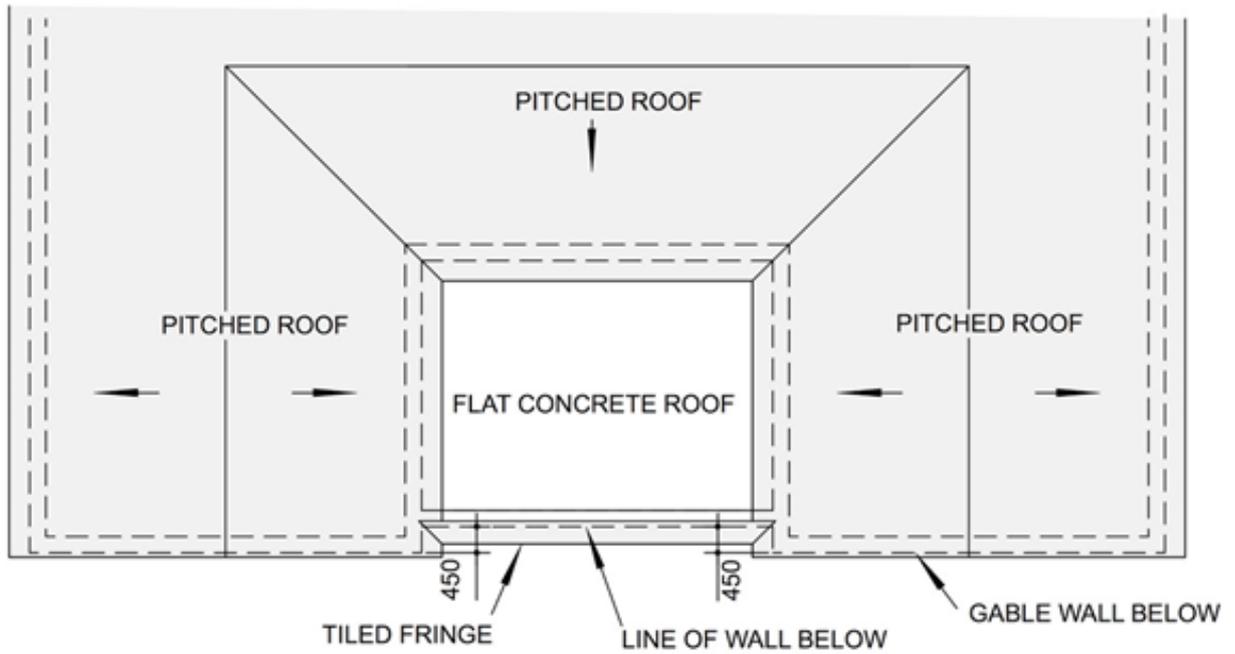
Plan view of flat roof with fringed edge between wings with gable ends.
